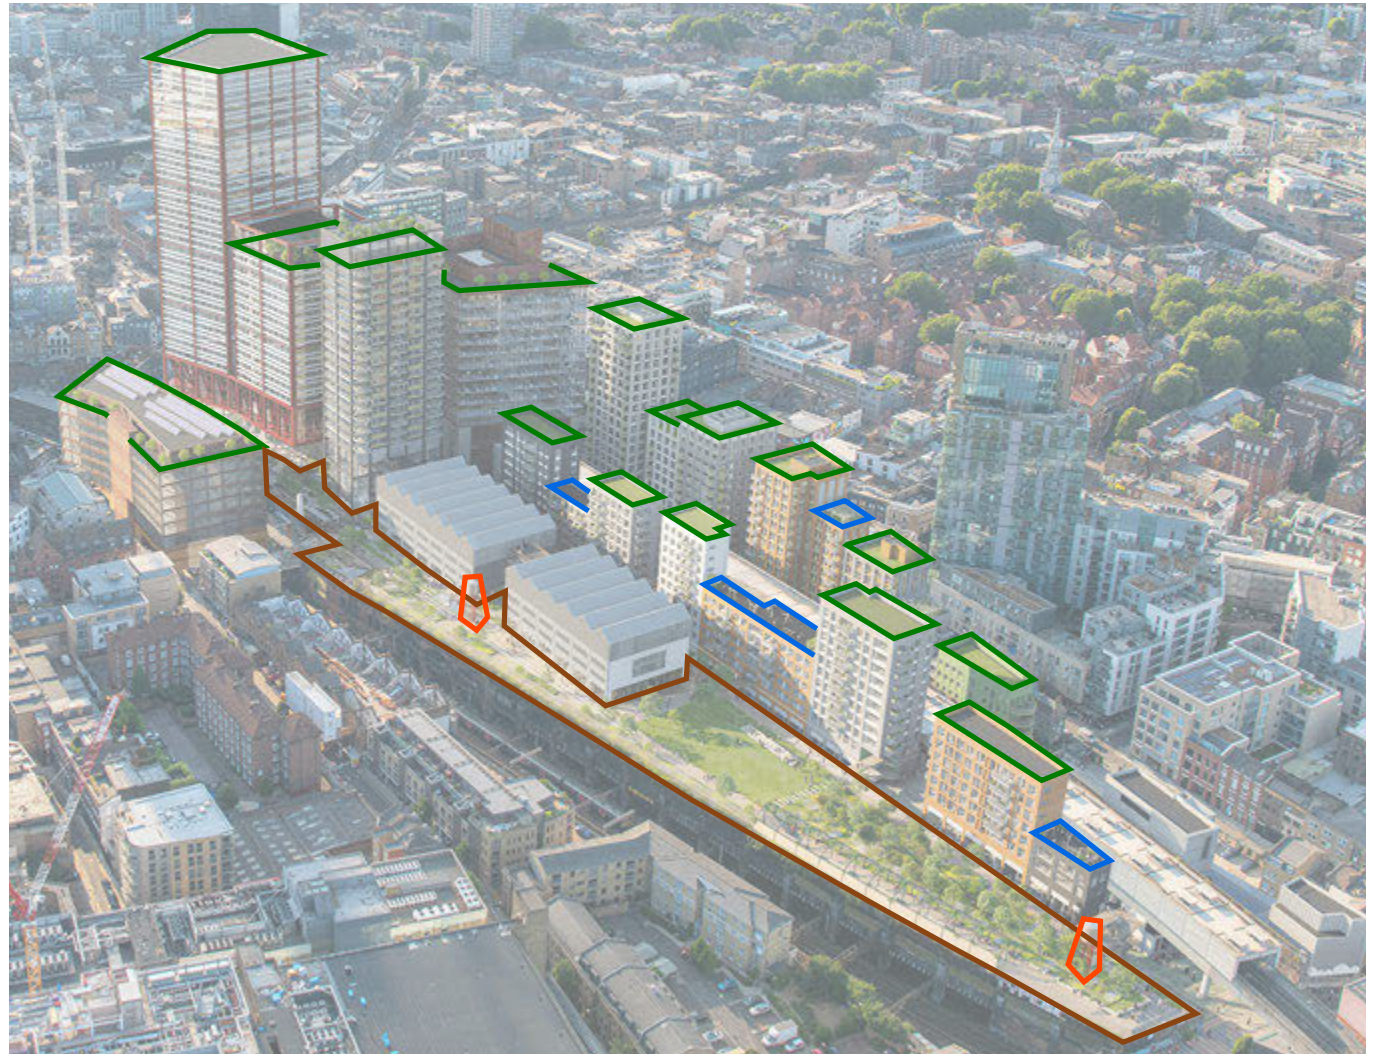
Aerial view highlighting selected proposed site wide sustainability measures
